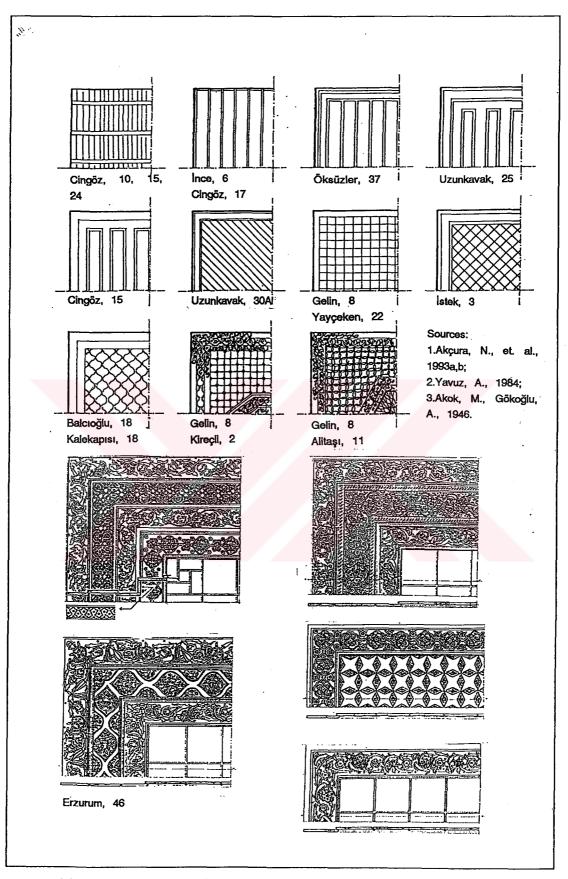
Some Examples from Common Ceiling Types in Ankara Houses
